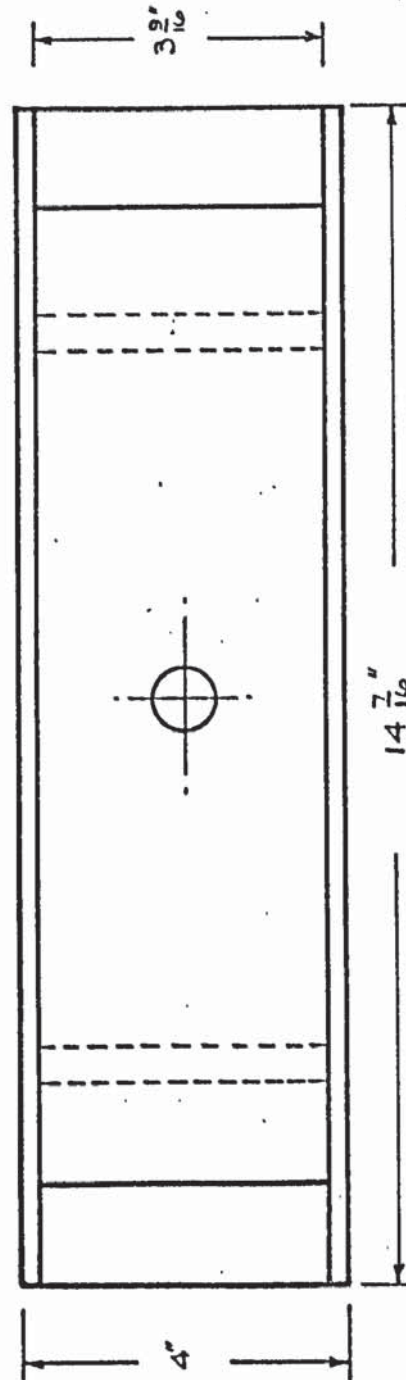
DETAIL OF MODEL FOUNDATION.
